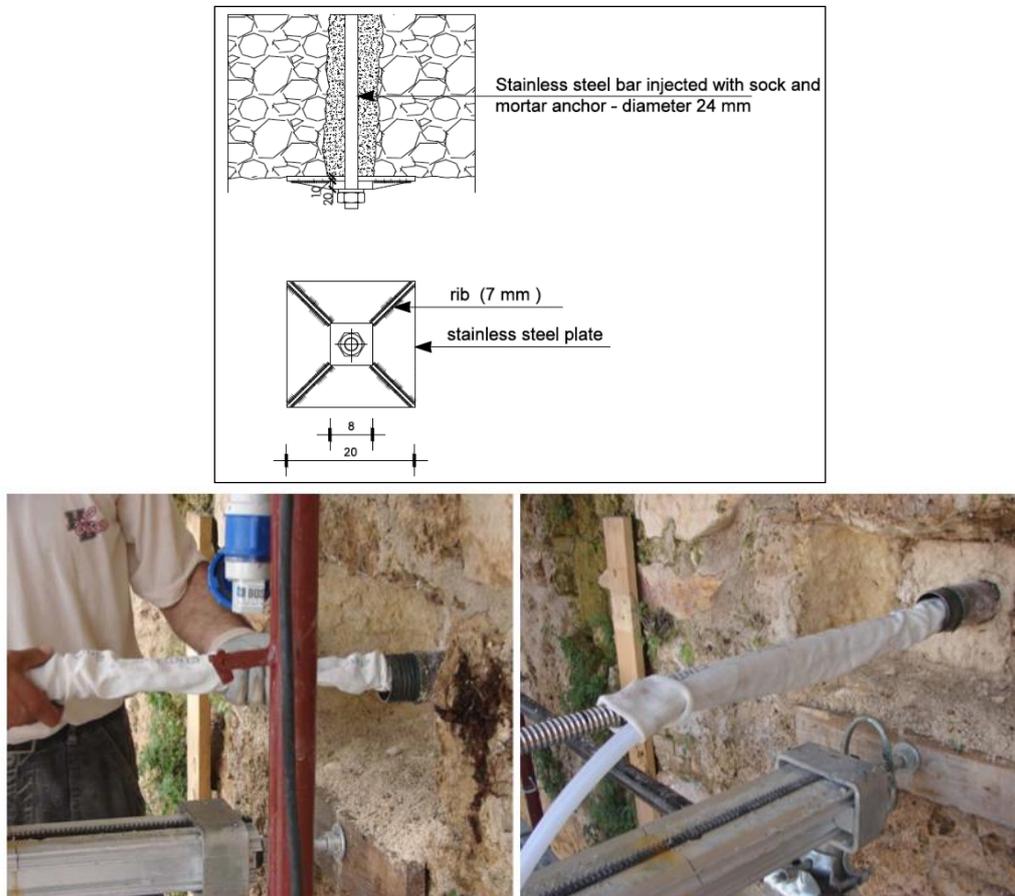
Installation of a stainless steel bar injected with sock and reinforcing anchoring steel plate.
